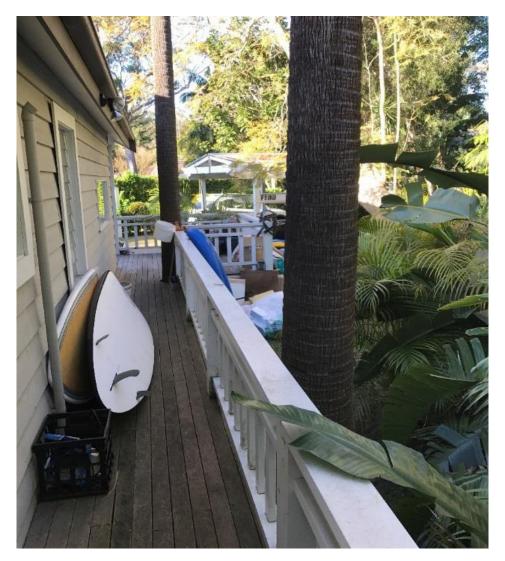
Tree 8 (at back) and Tree 9 (foreground) are examples of existing palms that have previously had decks constructed within their Tree Protection Zones (TPZs). The deck is to be removed near these two trees and a new driveway and parking area built within their TPZs. The driveway will have to be constructed so that it is piered and elevated over the roots in the TPZs.
